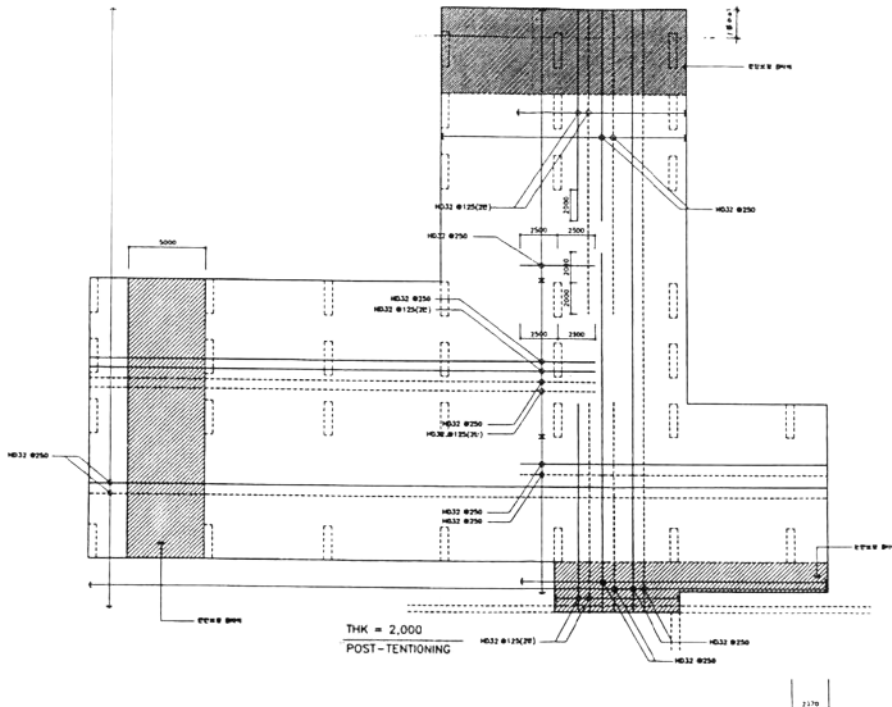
Plan of Transfer Plate with Post Tension Type Building
